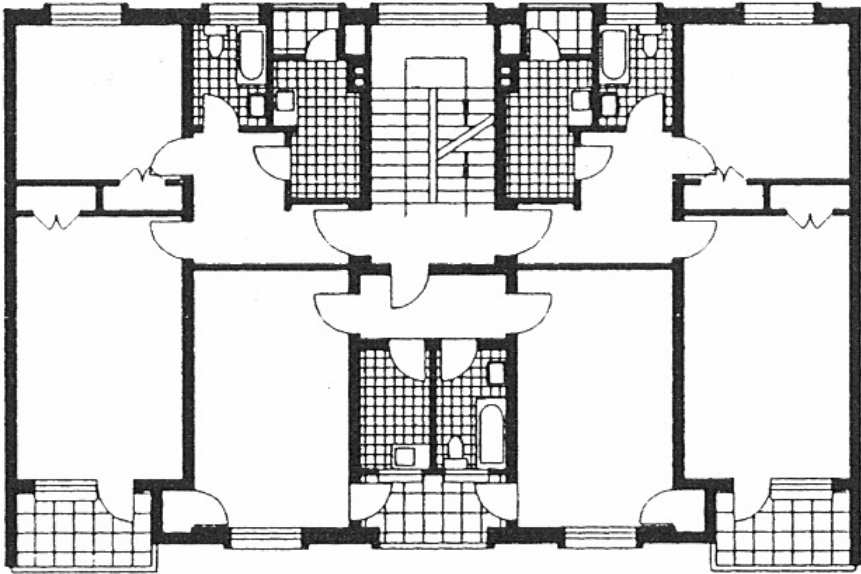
A 2-2-2 Unit Plan with a short open corridor
